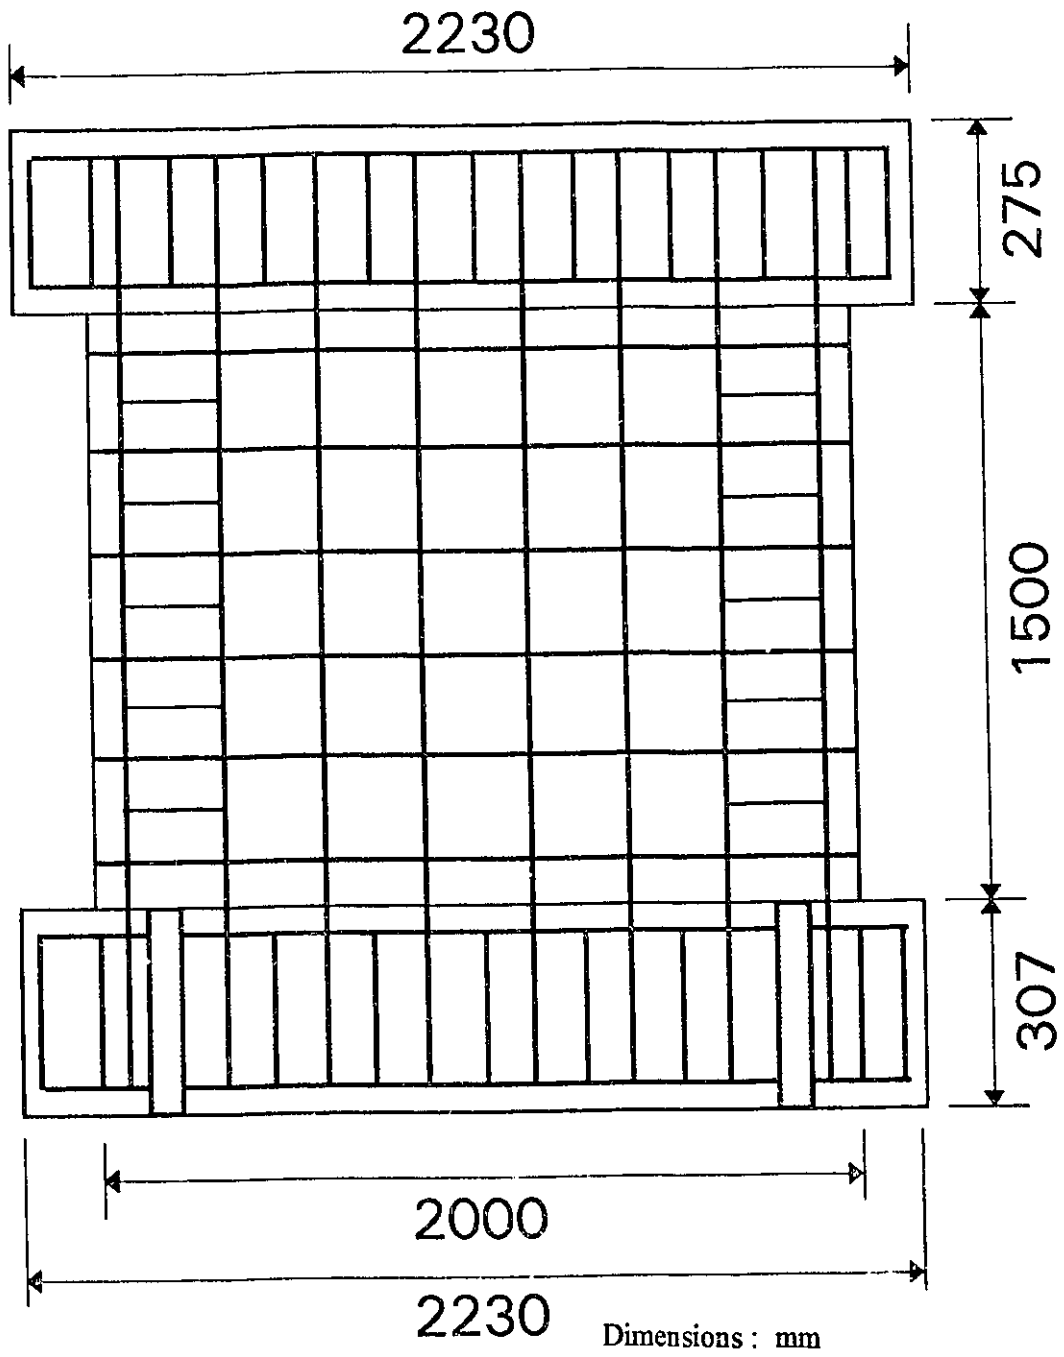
Geometry and Reinforcement Layout of Wall 7
